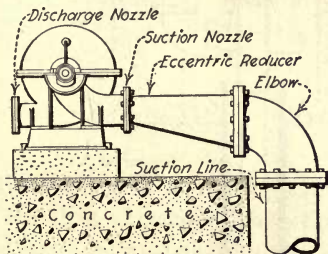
Showing How Enlarged Suction Line Should Be Connected To Centrifugal Pump.
